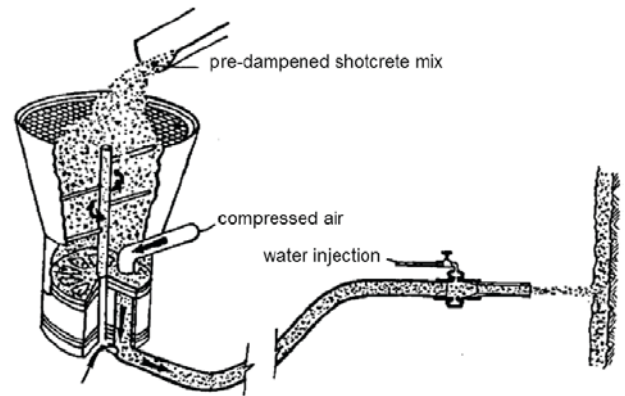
Simplified sketch of a typical dry mix shotcrete system.
